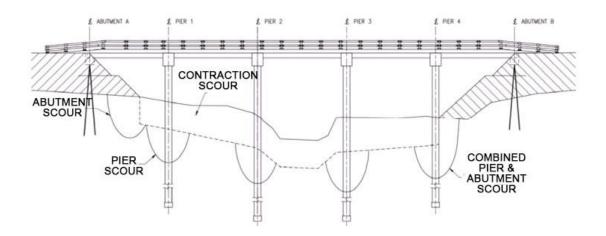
, Scour locations on a Bridge (Department of Transport and Main Roads 2013)
